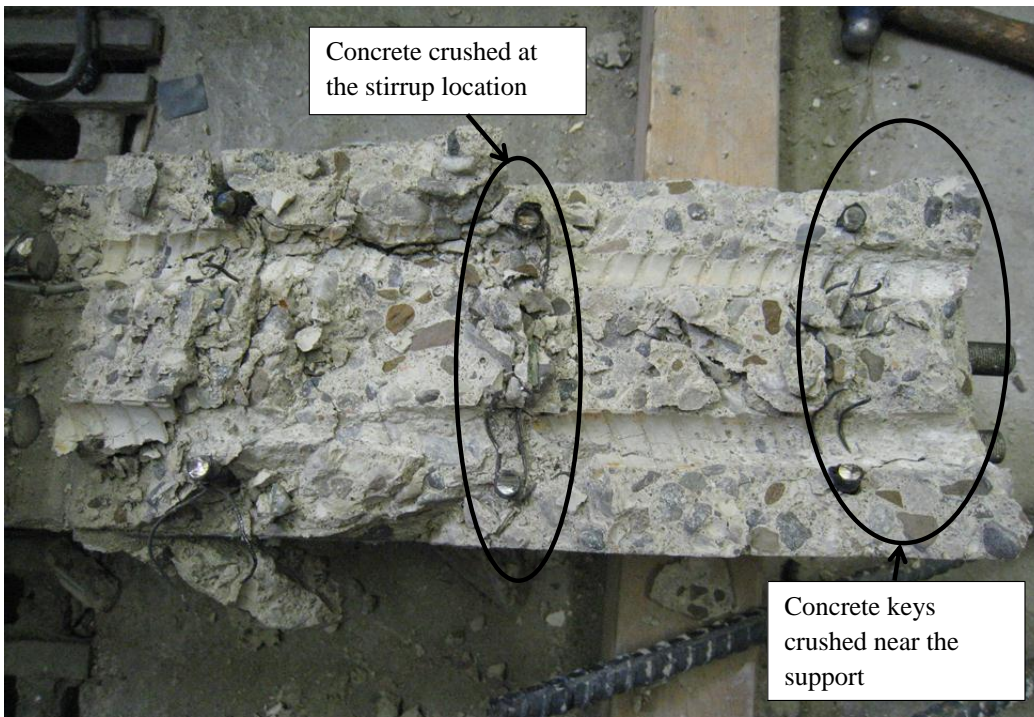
Concrete on top of the reinforcing bar after failure for Beam M-A*-100-0-U. The beam is turned upside-down.
